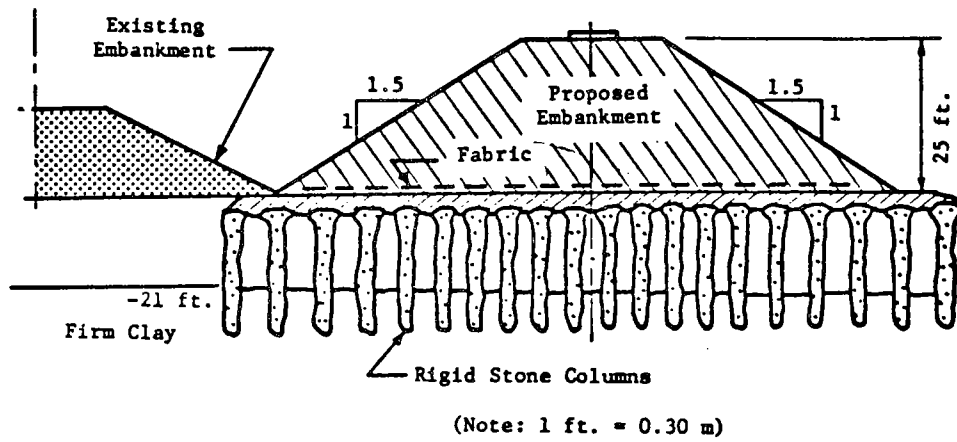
EMBANKMENT SECTION AT MUNICH, GERMANY - RIGID STONE COLUMNS.
